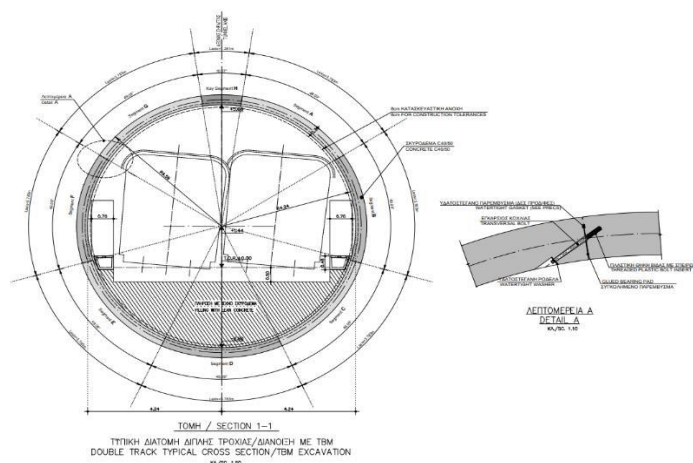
Standard cross – section of a double – track tunnel / excavated with TBM (Attiko Metro S.A.)
